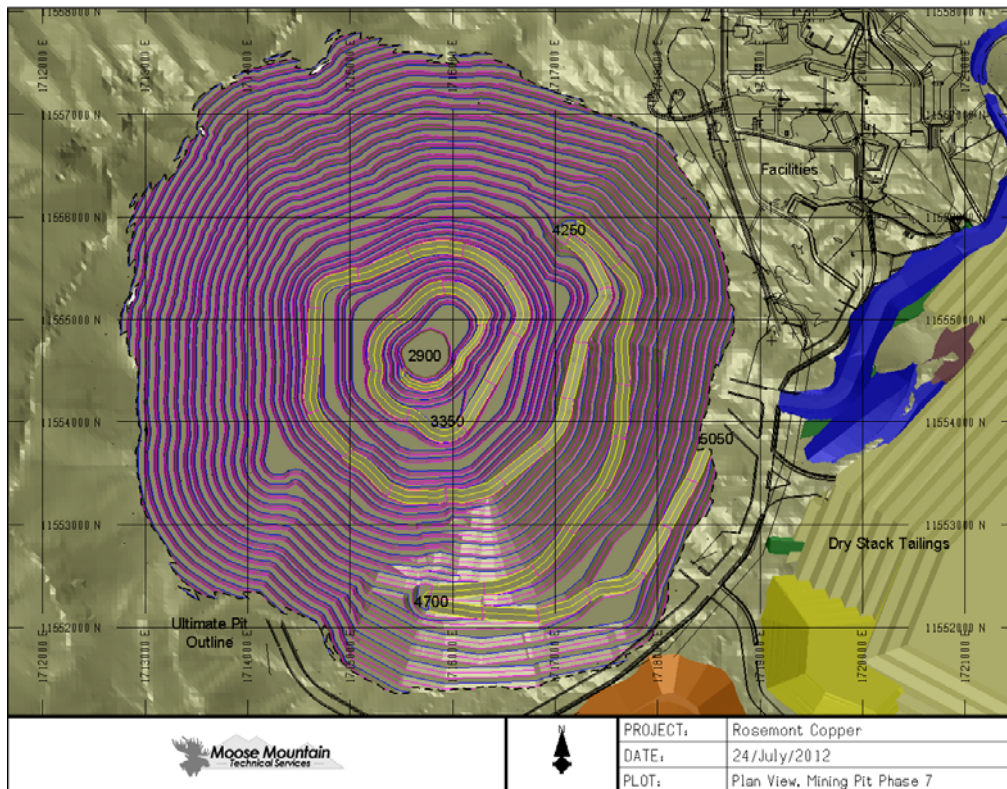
Plan View of Mining Pit Phase 7 (Ultimate Pit)
